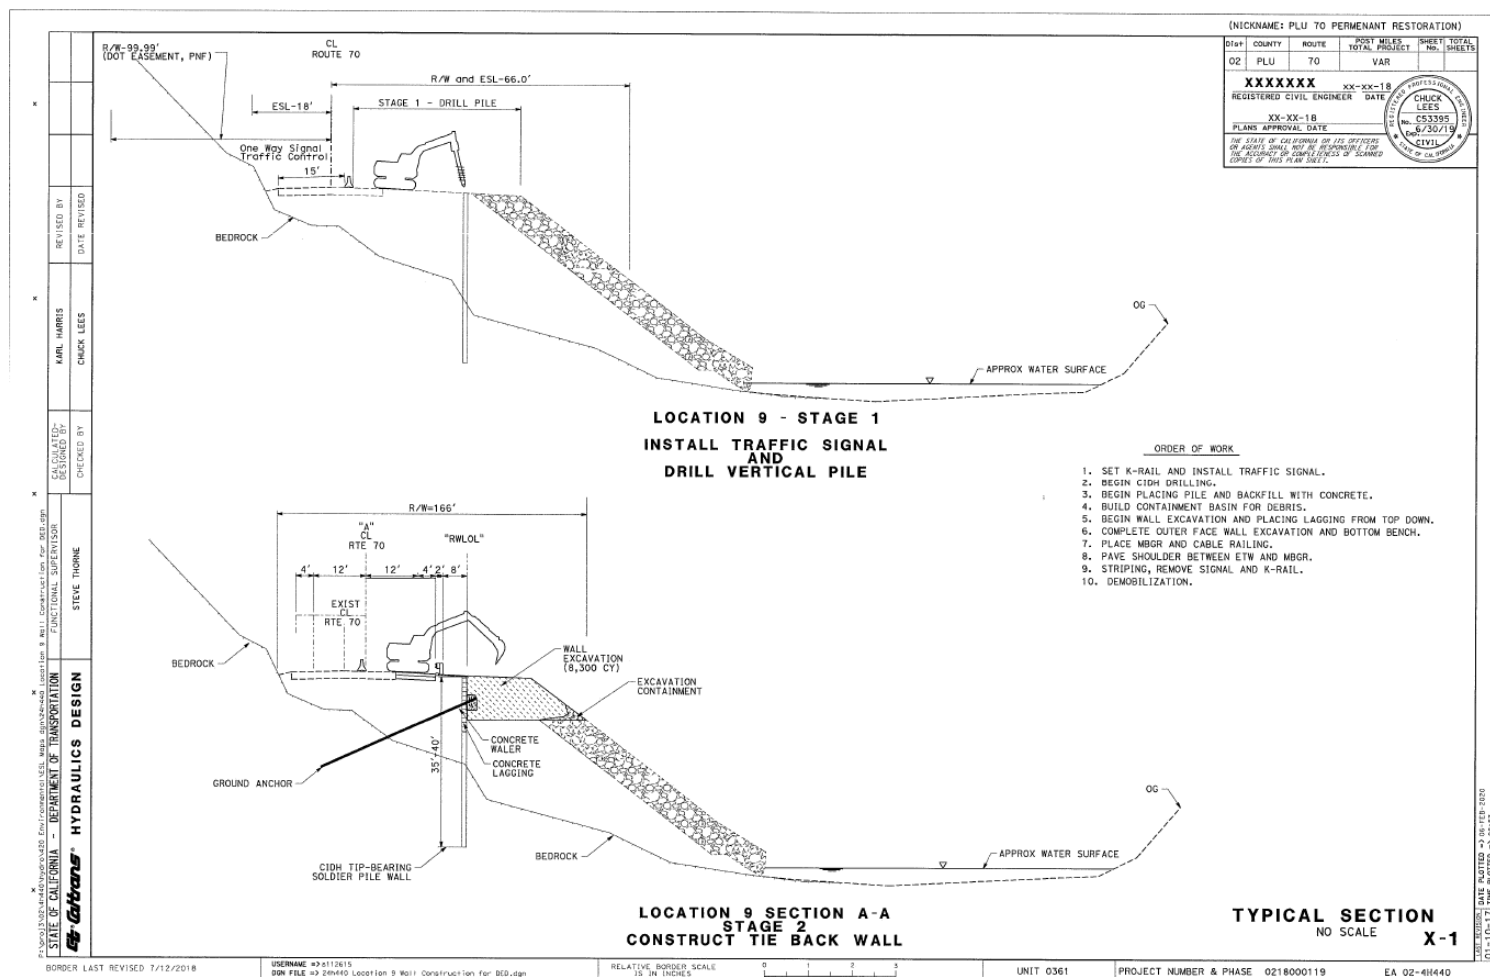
Preliminary Design of Tie Back Retaining Wall Construction
